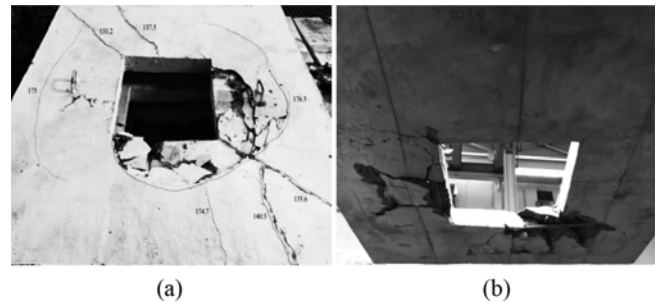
The Failure Mode and Cracking Pattern for the Slab SOSM: (a) Compression Side, (b) Tension Side
